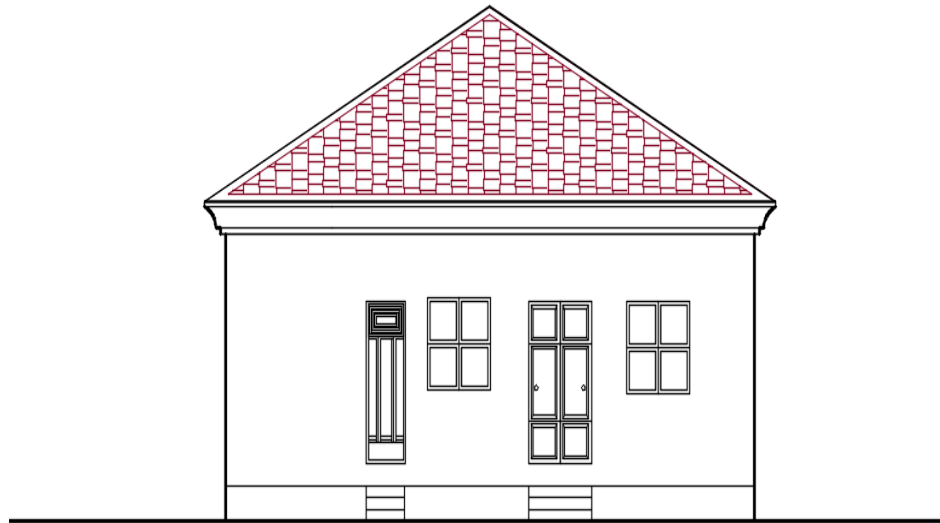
Switch Room Design – Approach Elevation (All Dimensions in mm)
